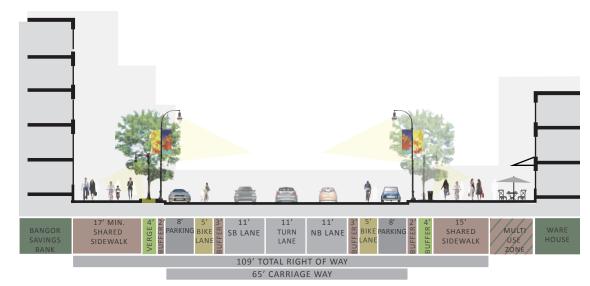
Section DD'Through Franklin Street Near Fore St. Looking North
